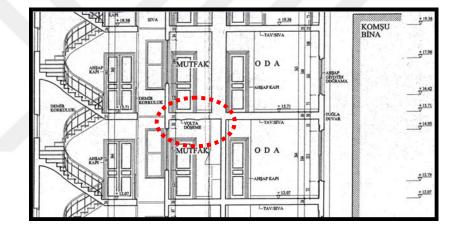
Floor arch on 3rd floor (taken from survey 1/50 scale A-A Section)
